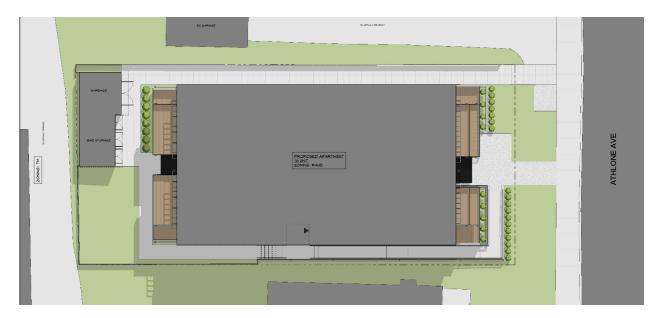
Proposed Site Plan, Colour (Source: Grant Henley Design Group)
